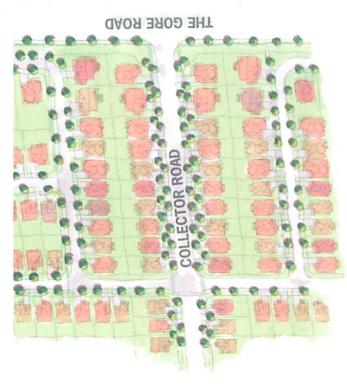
CONCEPT PLAN AREA 5: COLLECTOR/ARTERIAL INTERSECTION AND POTENTIAL ENTRY FEATURE LOCATION
